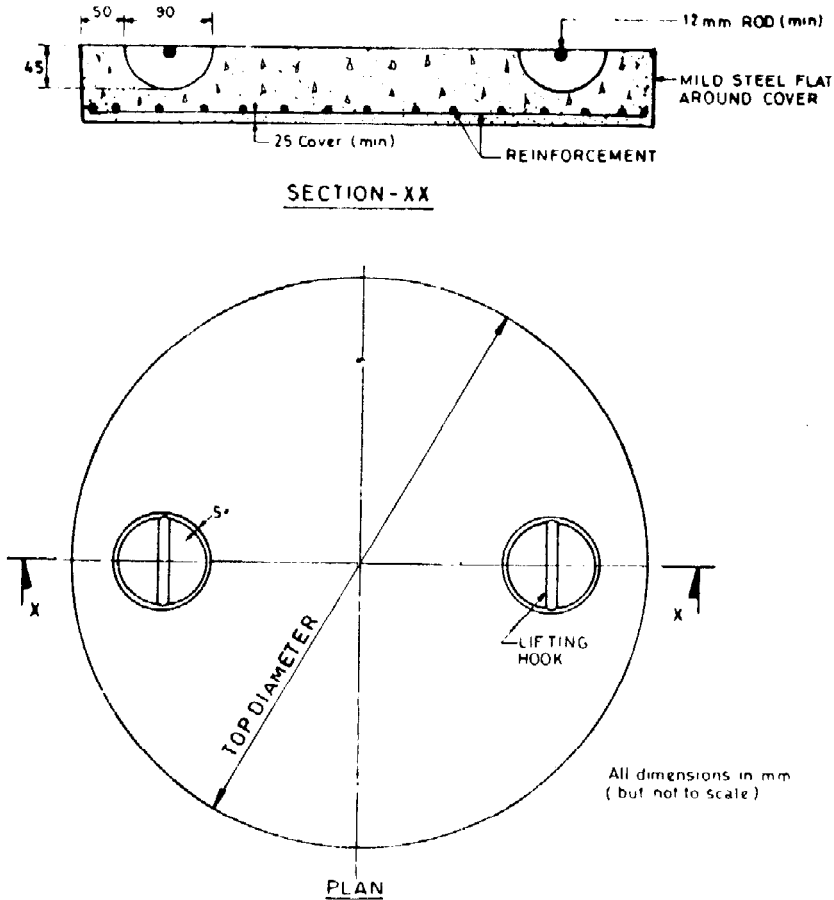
TYPICAL ILLUSTRATION OF A CIRCULAR PRECAST CONCRETE MANHOLE COVER
